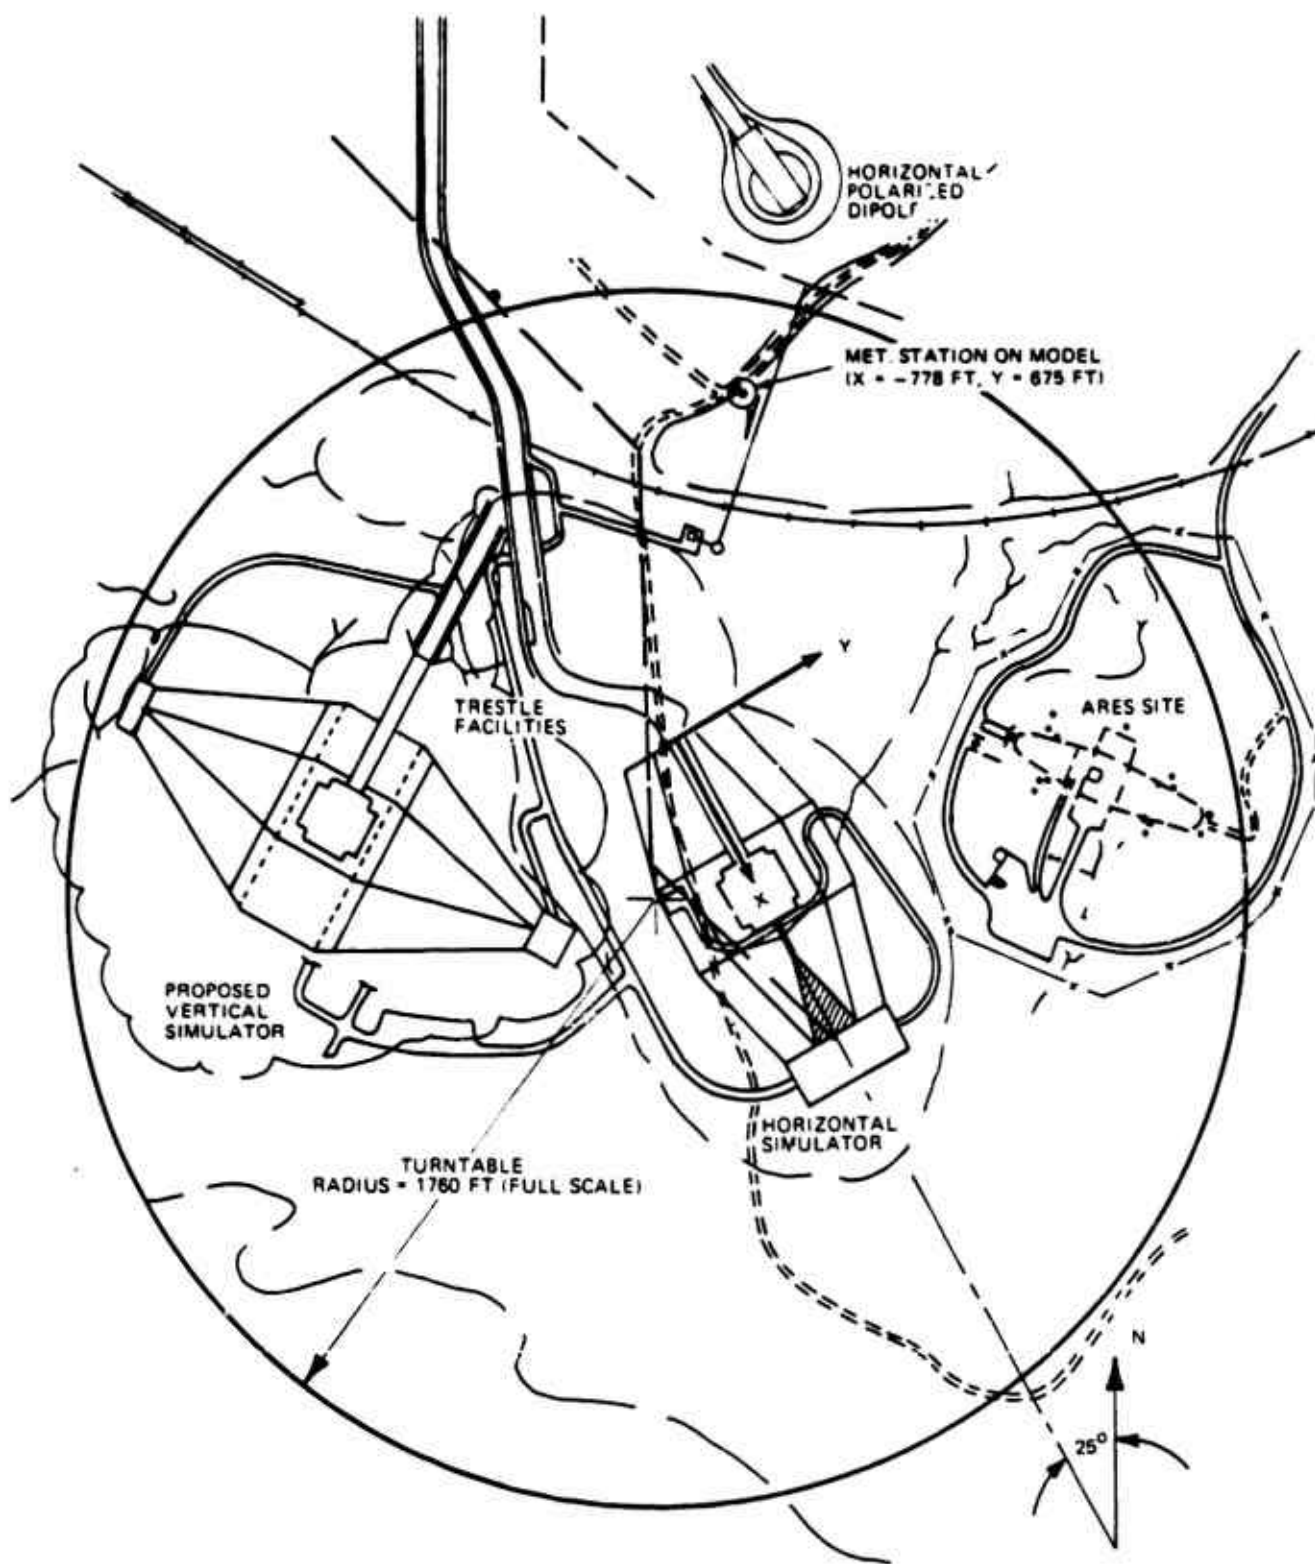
Plan View of Trestle Facility and Surrounding Area Modeled on ASF Turntable
